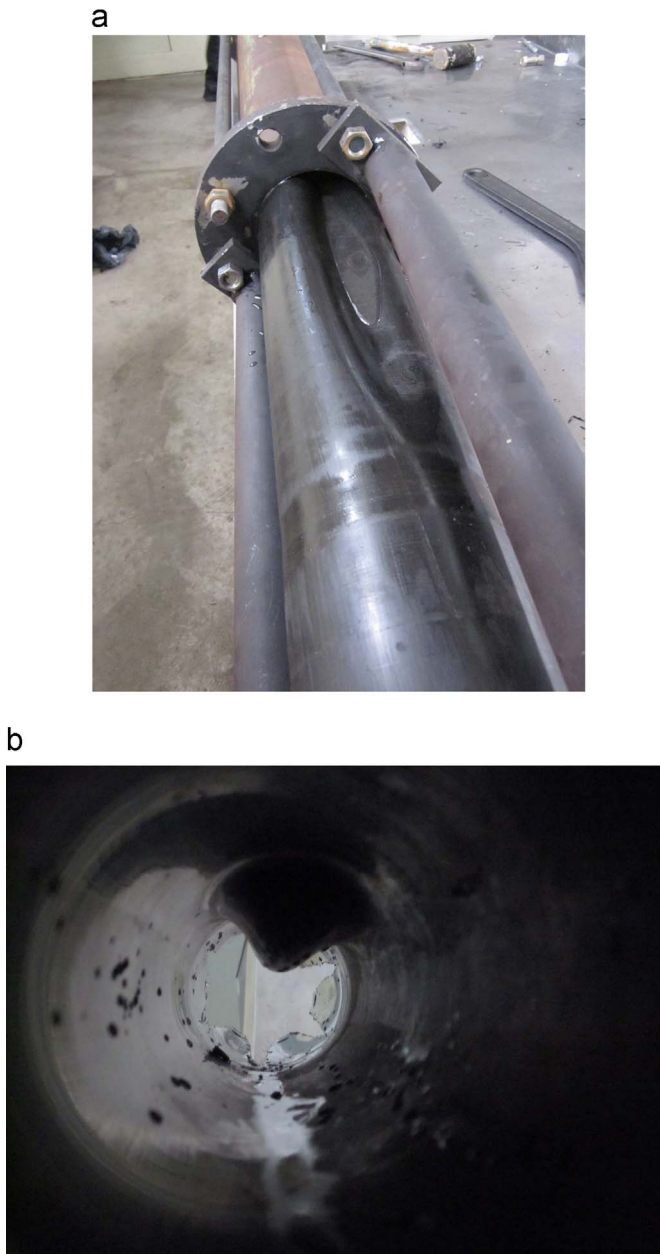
Collapsed liner after laboratory buckling collapse test: a) while the pipe is extracting outside the host steel pipe b) an inside view.
